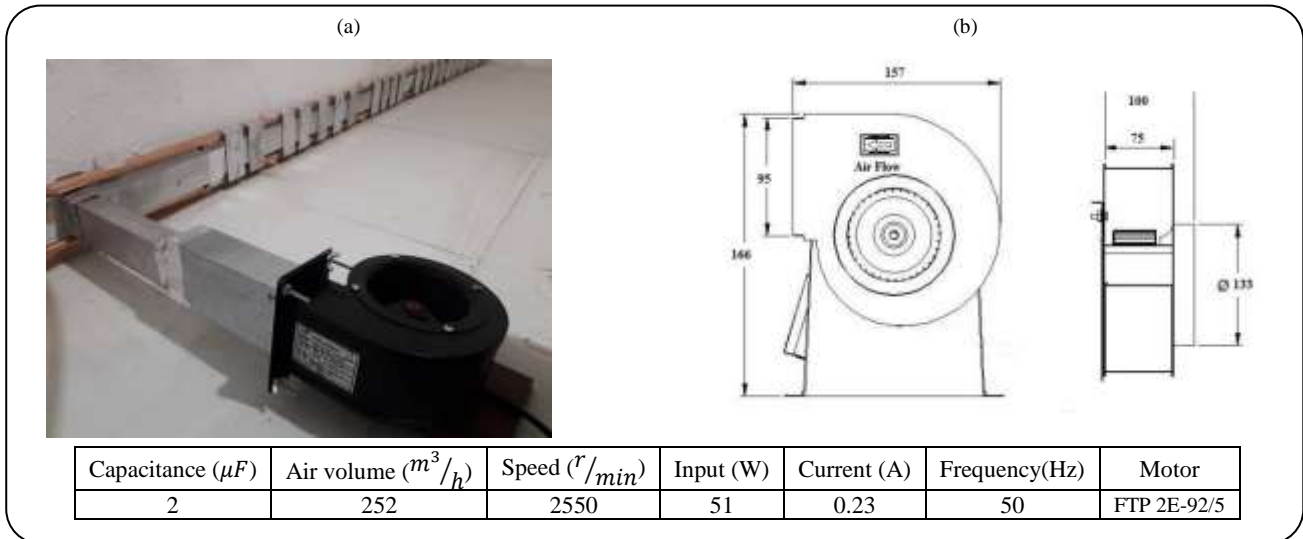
(a) Centrifugal blower connected to the skirting board heating system, (b) Technical scheme of the blower.
